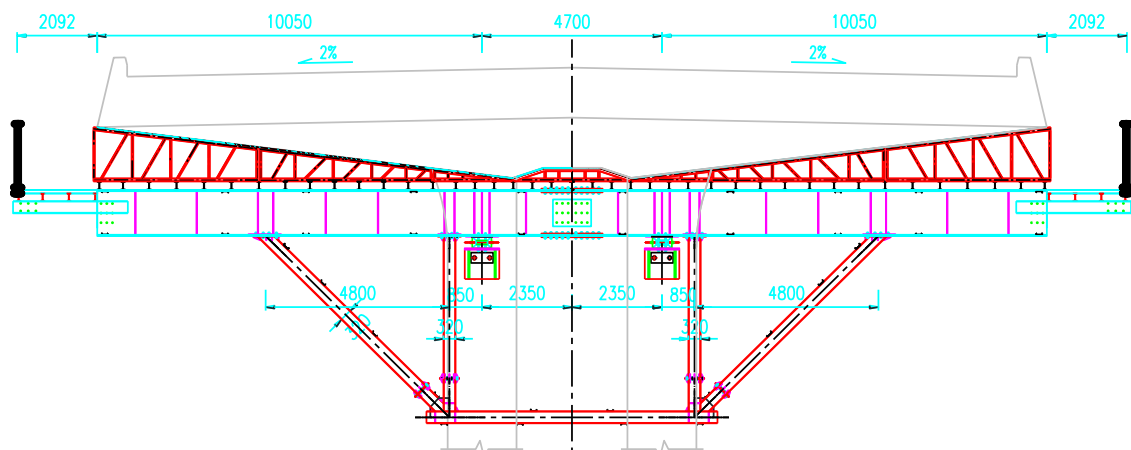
Design of the double-column bent cap ground-free support for Hangzhou Shidai Avenue (unit: mm)
